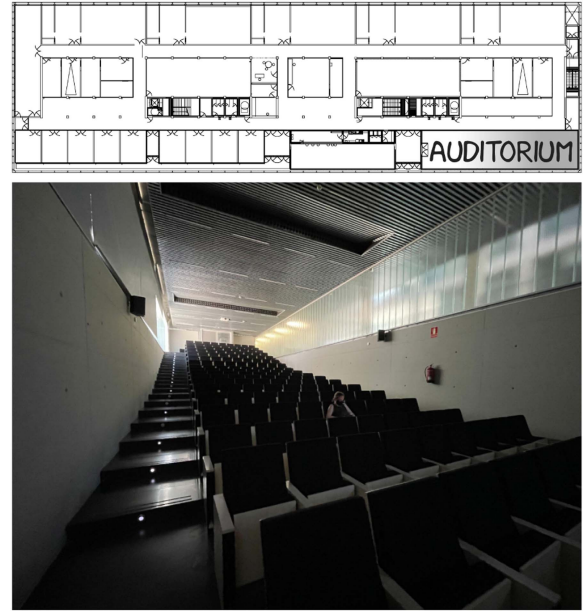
Floor plan of track 3 (2021) environment and its auditorium (located on the bottom-right corner in floor 1).
